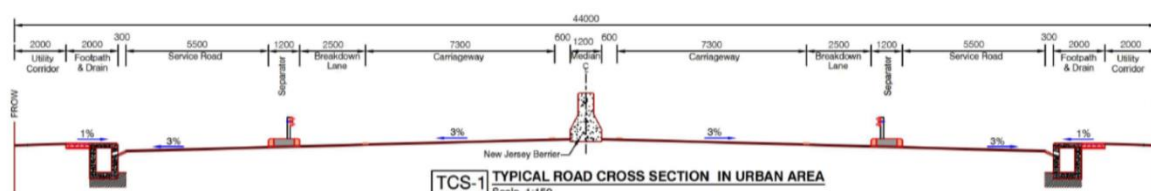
Typical Urban Road Cross-Section used for WeCare Project
